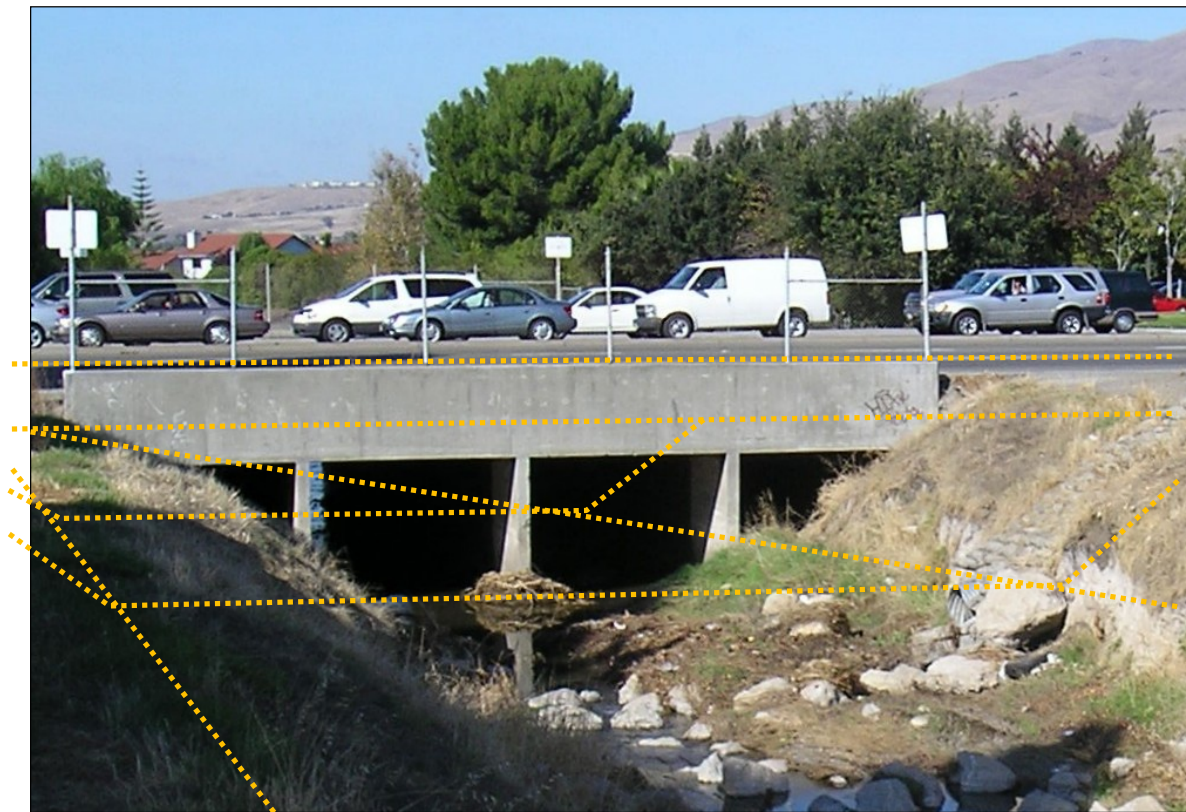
Schematic View of Calaveras Boulevard Bridge Replacement for Alternative 2B/d
